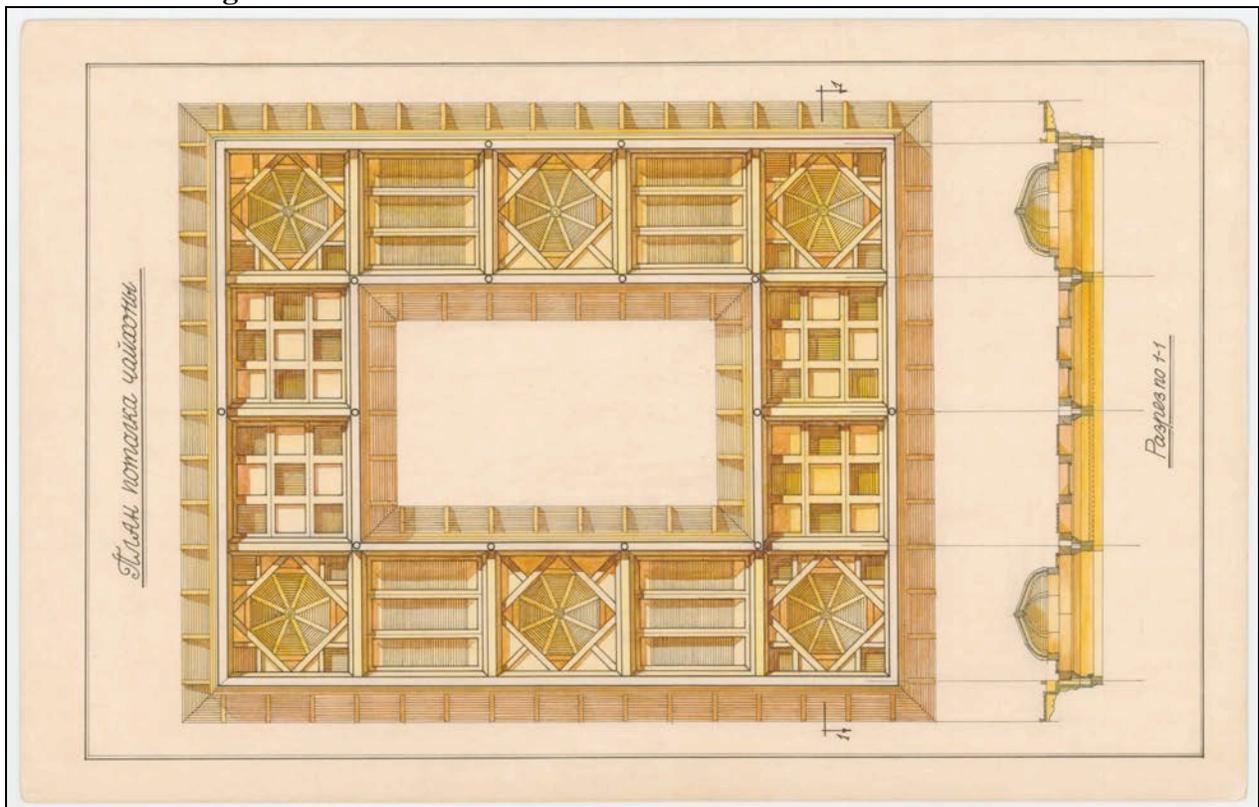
Boulder-Dushanbe Teahouse: Original Reflected Ceiling Plan, Lado Shanidze, 1988
